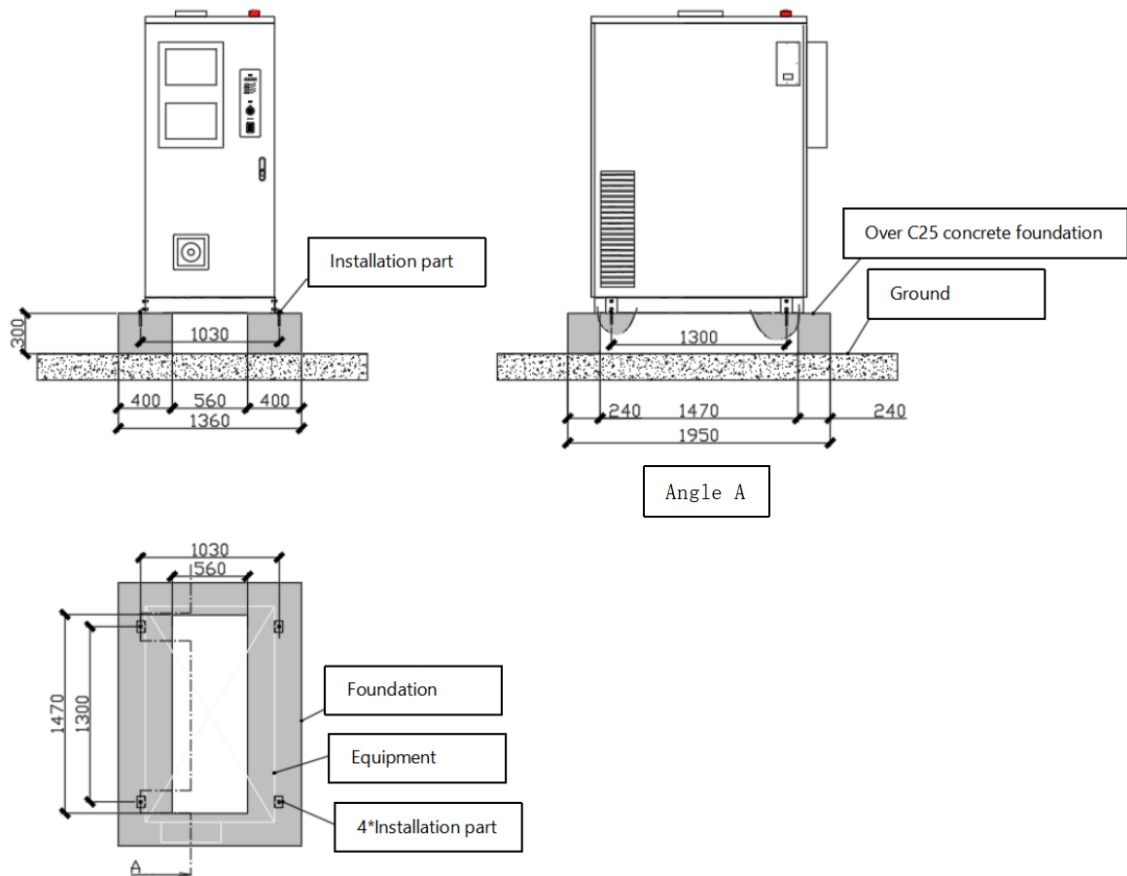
Equipment Foundation Drawing 2 (Ground with Bearing Capacity)
